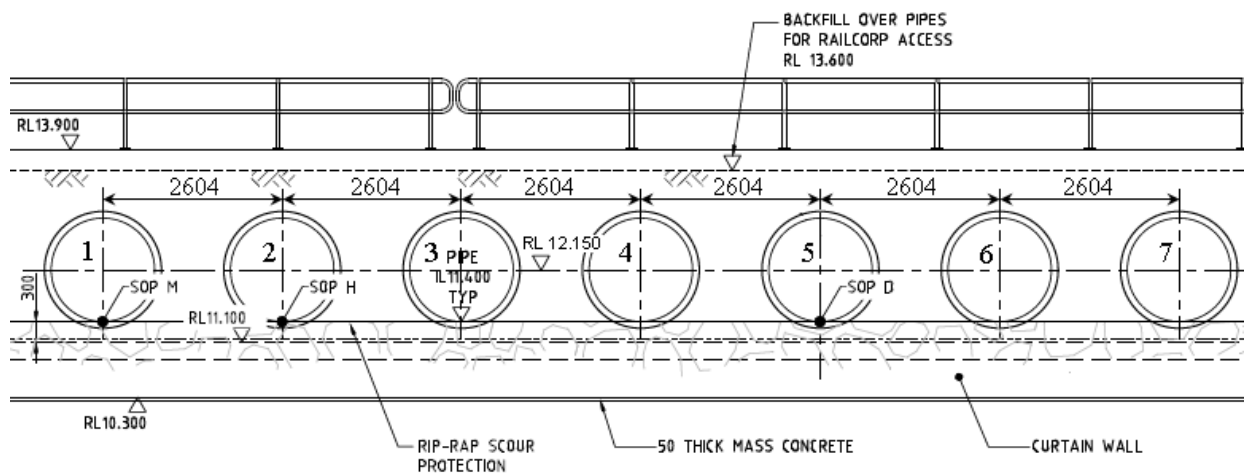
Gerringong Bypass Belinda Street Culvert C4480 finished cross section at embankment toe.
